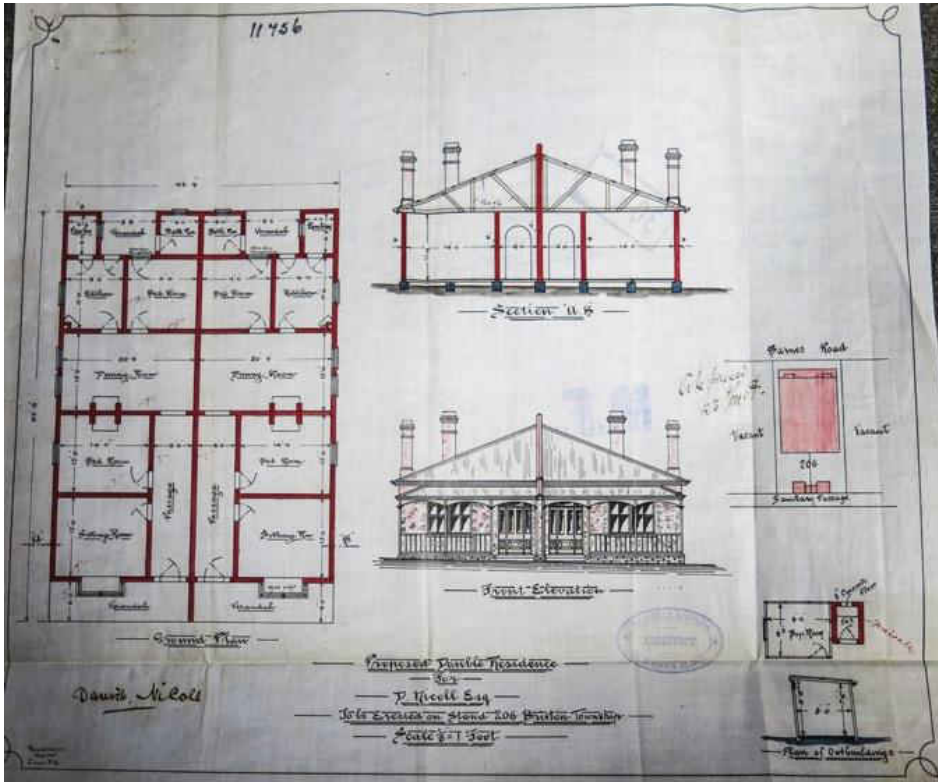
Plan for pair of semis with fire wall, wood trusses, chimneys and sash windows from 1904
